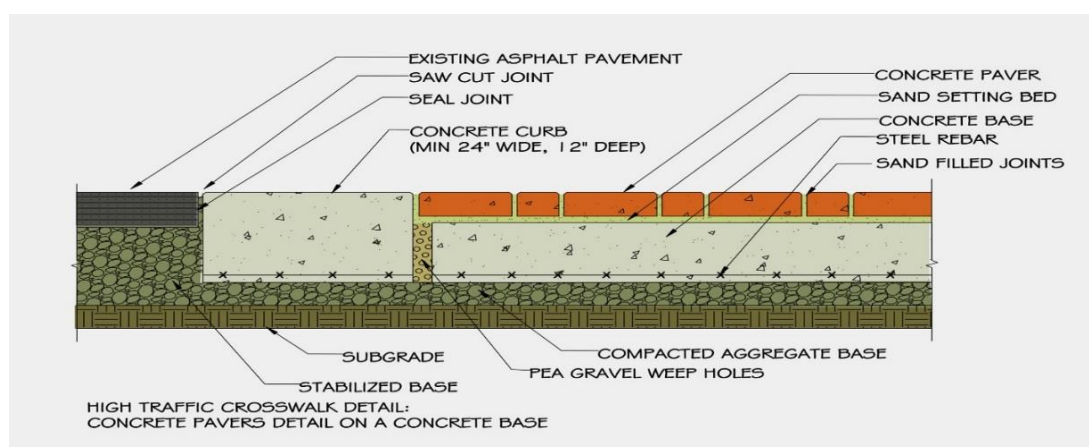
Permeable pavements design source (source: http://www.abbey-associates.com/splash-splash/blue_standards/porous_paving.html)
